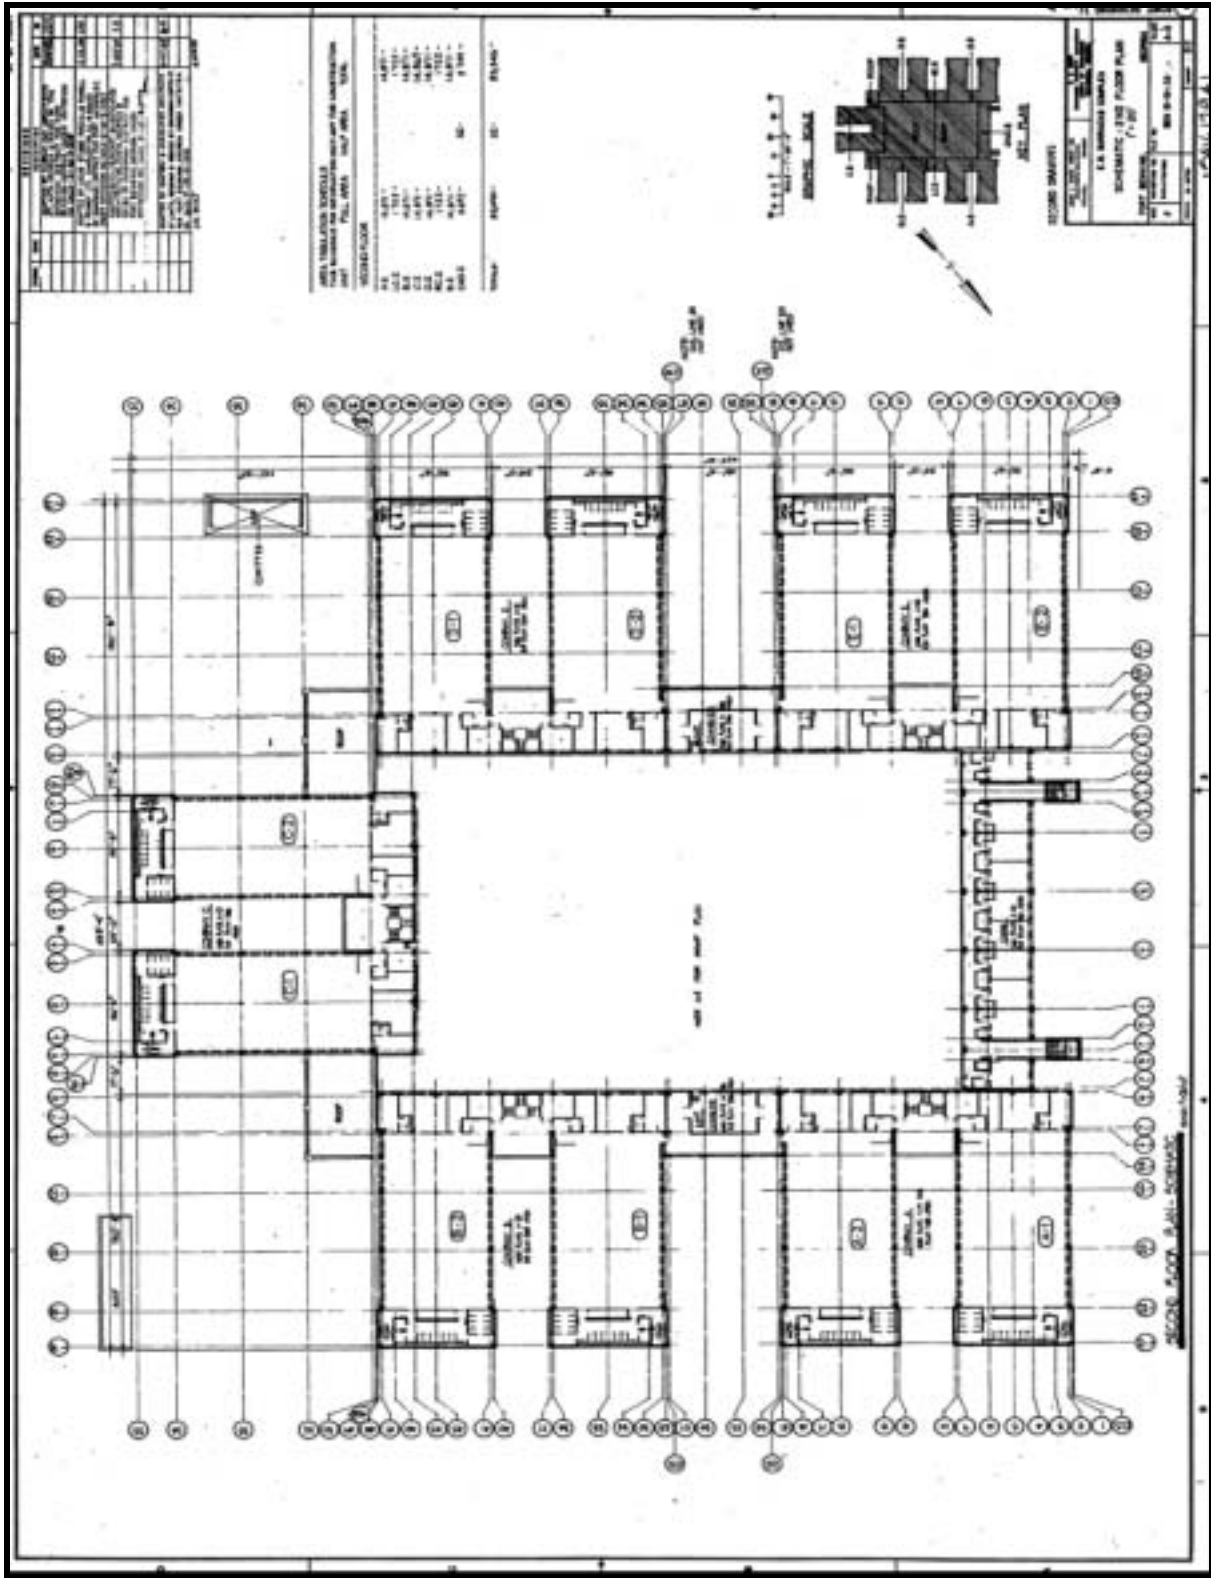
Starship barracks, second floor plan (ca. 1974, revised 1985) (Engineering, Ft. Benning)
